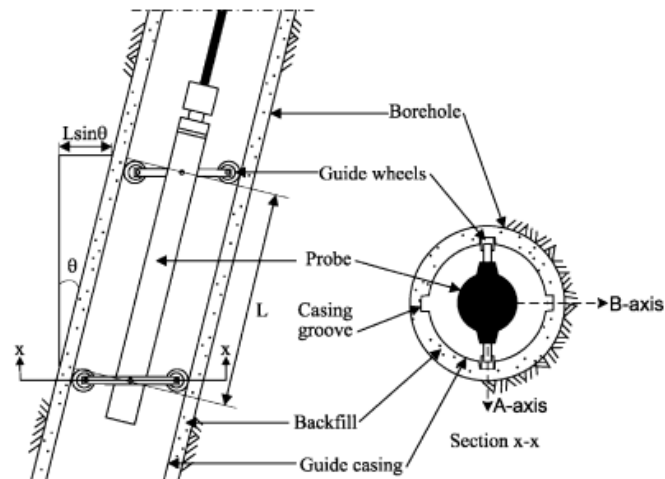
Illustration of the inclinometer probe inserted into the casing [9].
